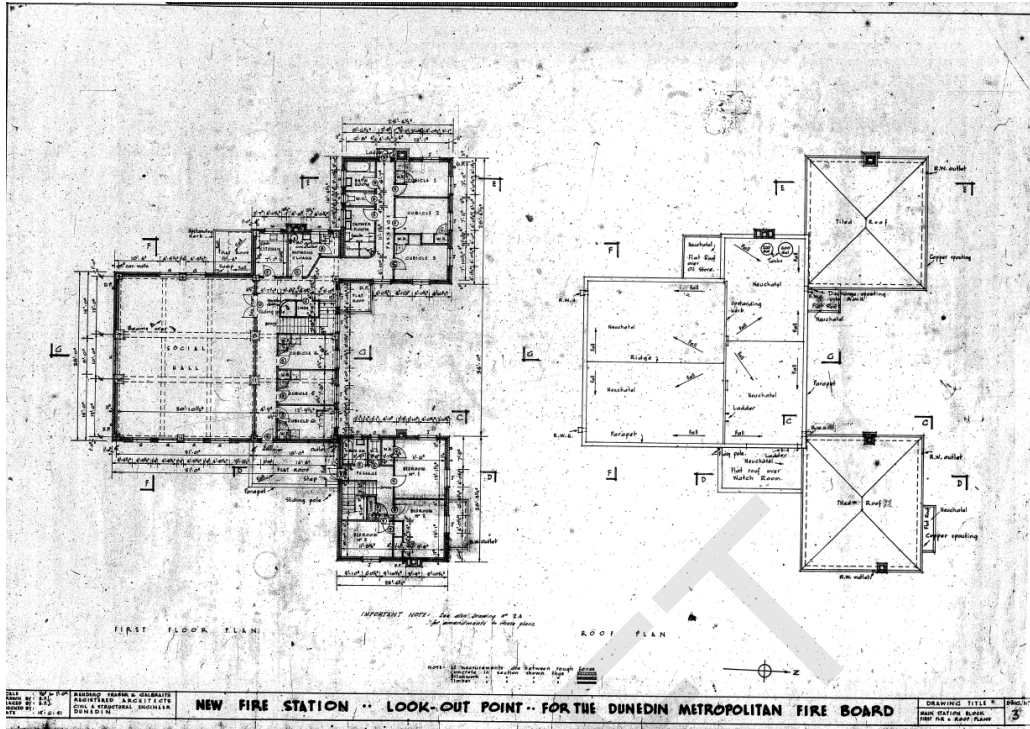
Roof and first floor plans of the Fire Station Block, Mandeno, Fraser and Galbraith, 1951.
